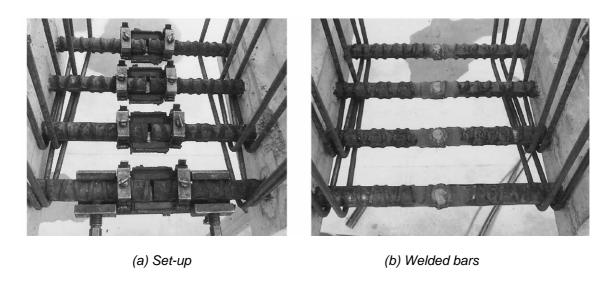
Example of a welded connection in a building in Japan (Courtesy of F. Watanabe)
